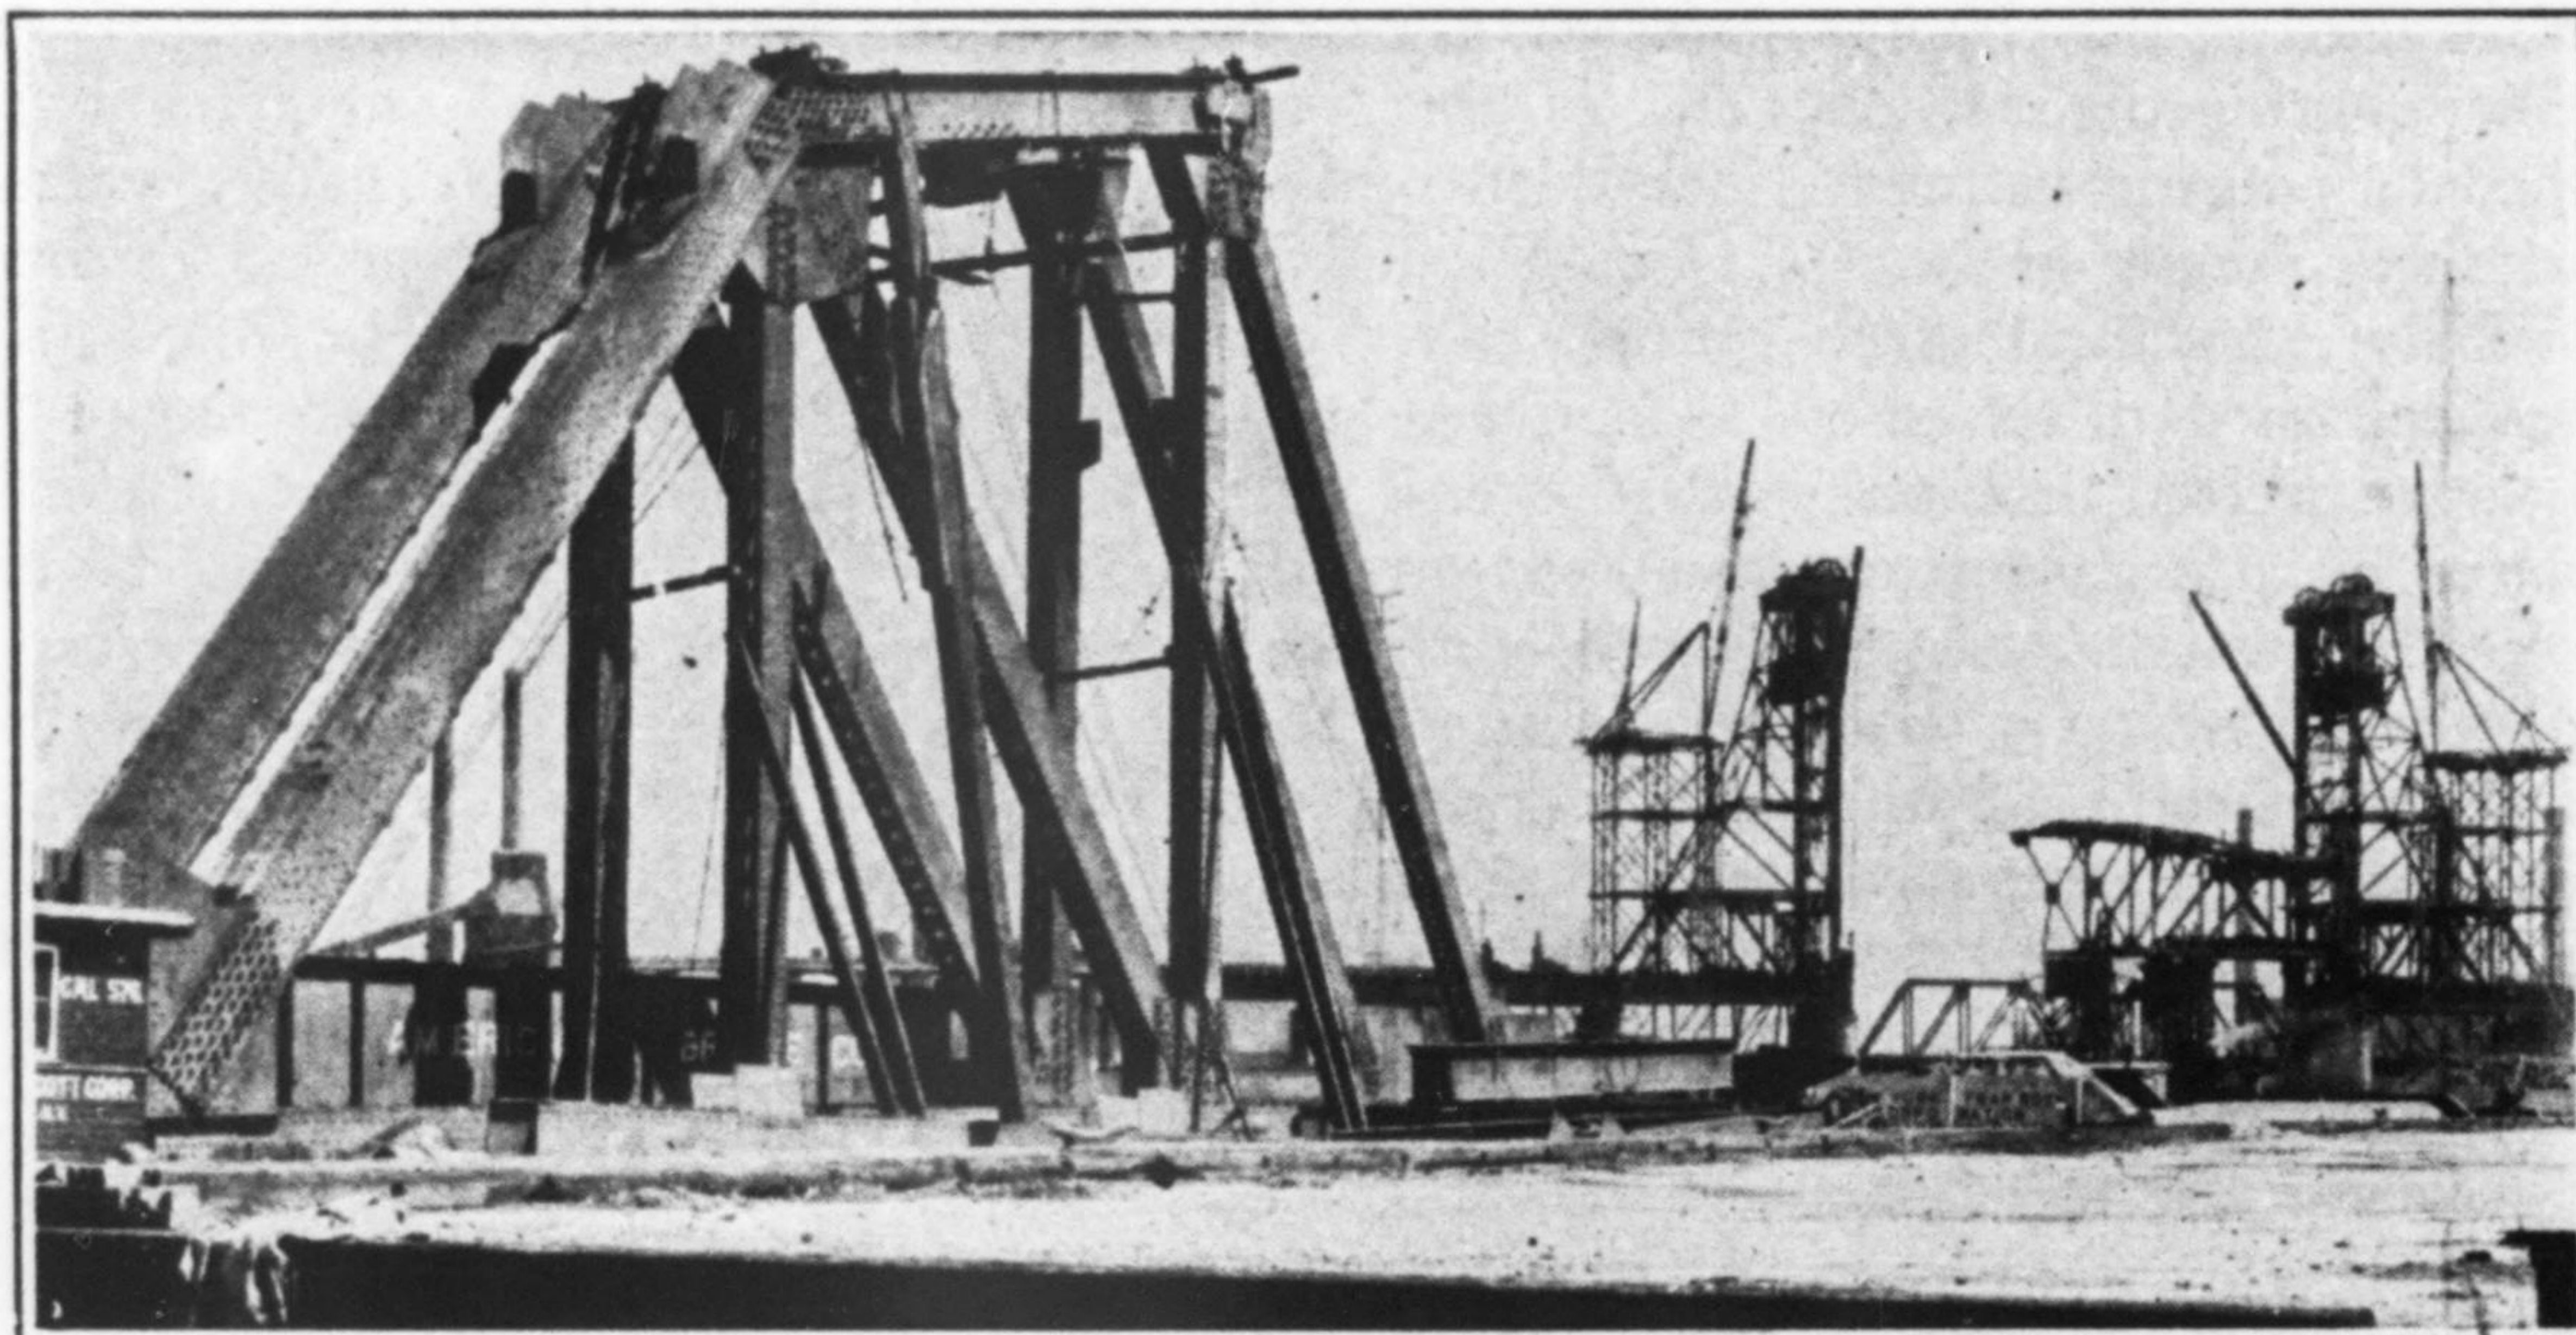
PART OF LIFT SPAN TRUSSES ASSEMBLED ON SCOW READY TO BE FLOATED TO BRIDGE SITE
